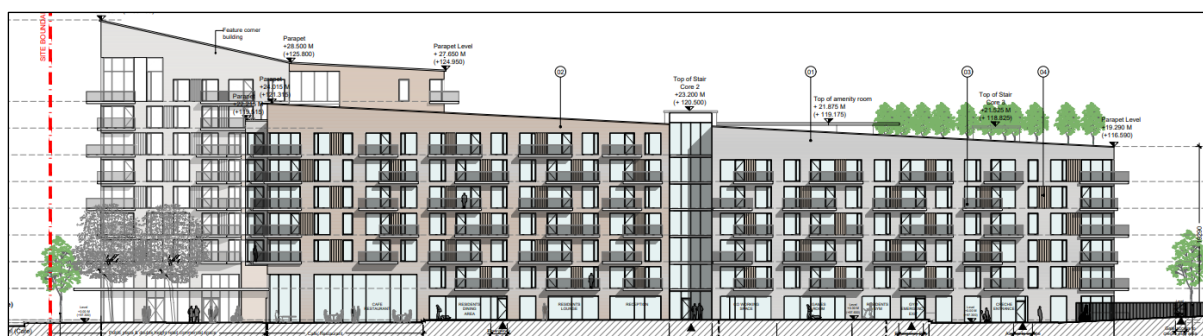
Western elevation (fronting Belgard Road) approved under ABP Ref. ABP-305763-19.
